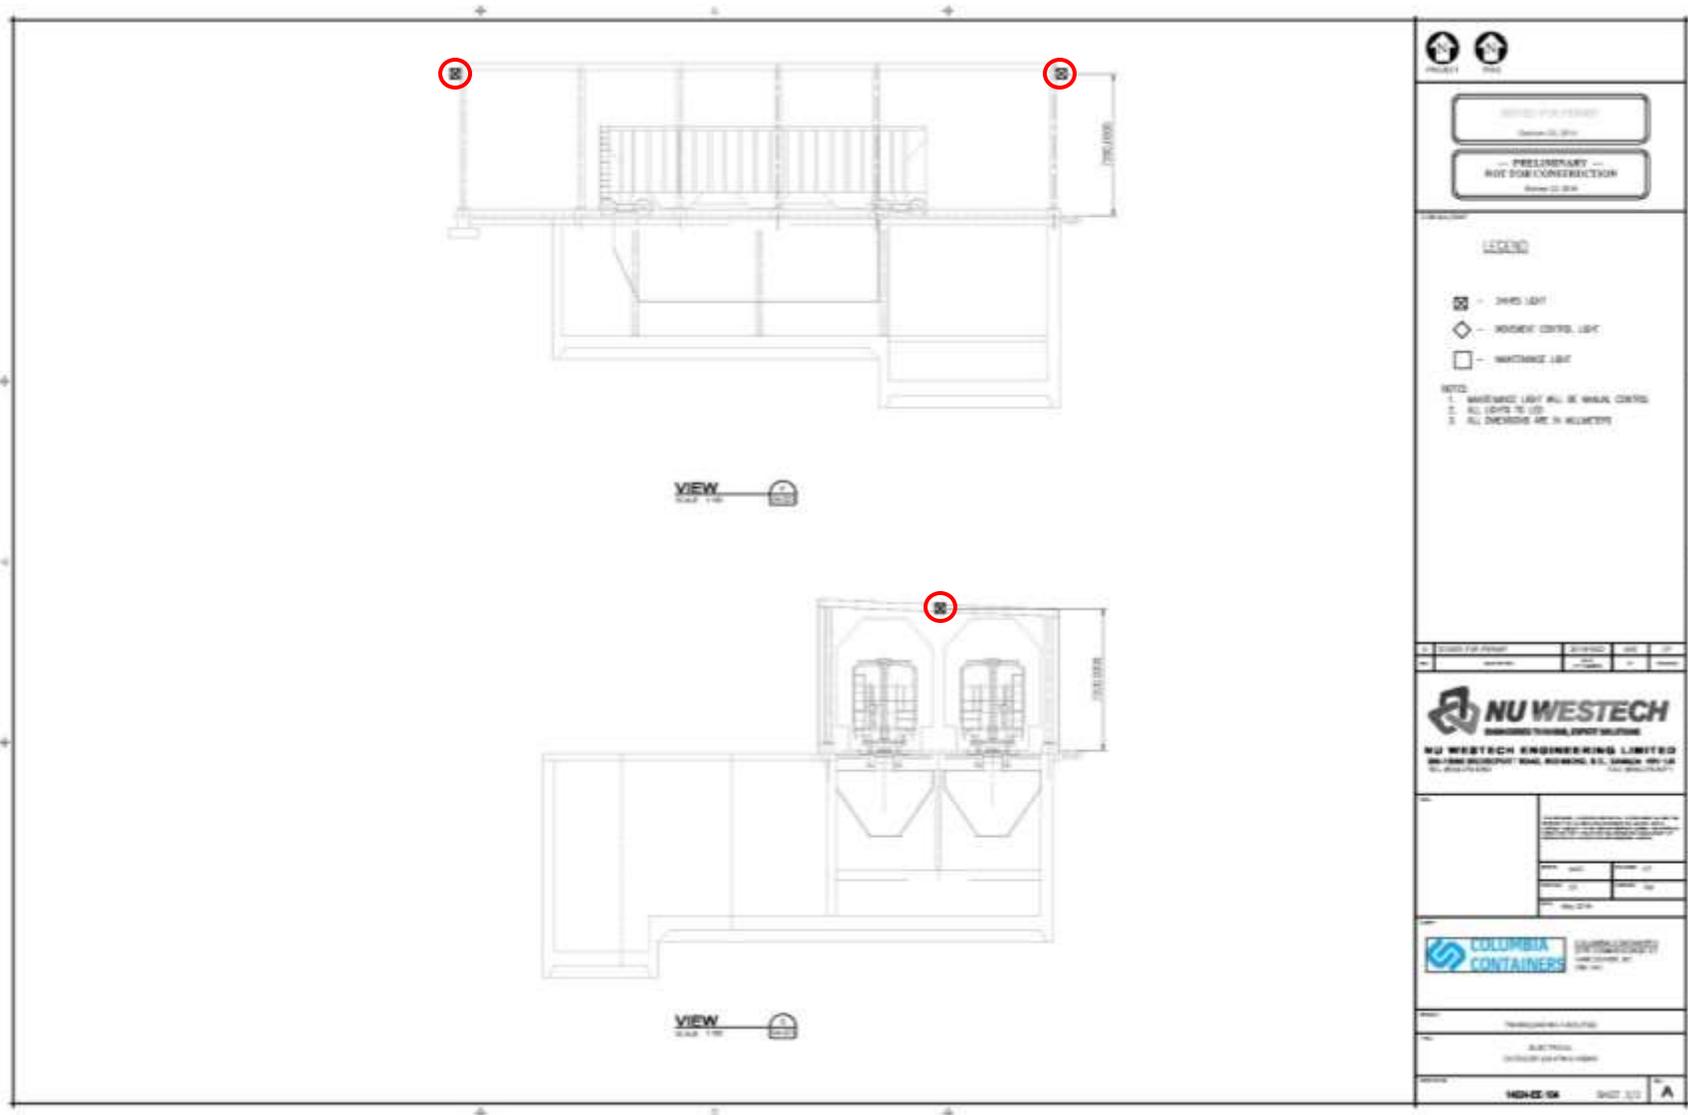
Columbia Containers Outdoor Lighting Plan: view 3, floodlights circled in red (Nu-Westech Engineering Ltd 2014)
